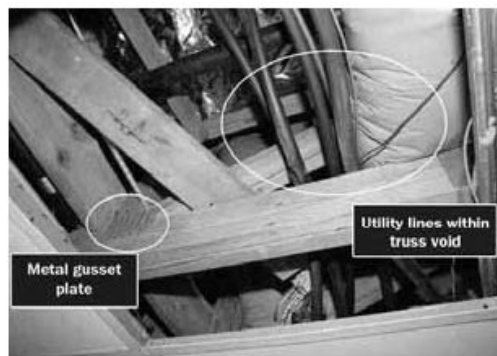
Gusset plates used to connect wooden truss members. (Photo courtesy of Kirk Grundahl.)
